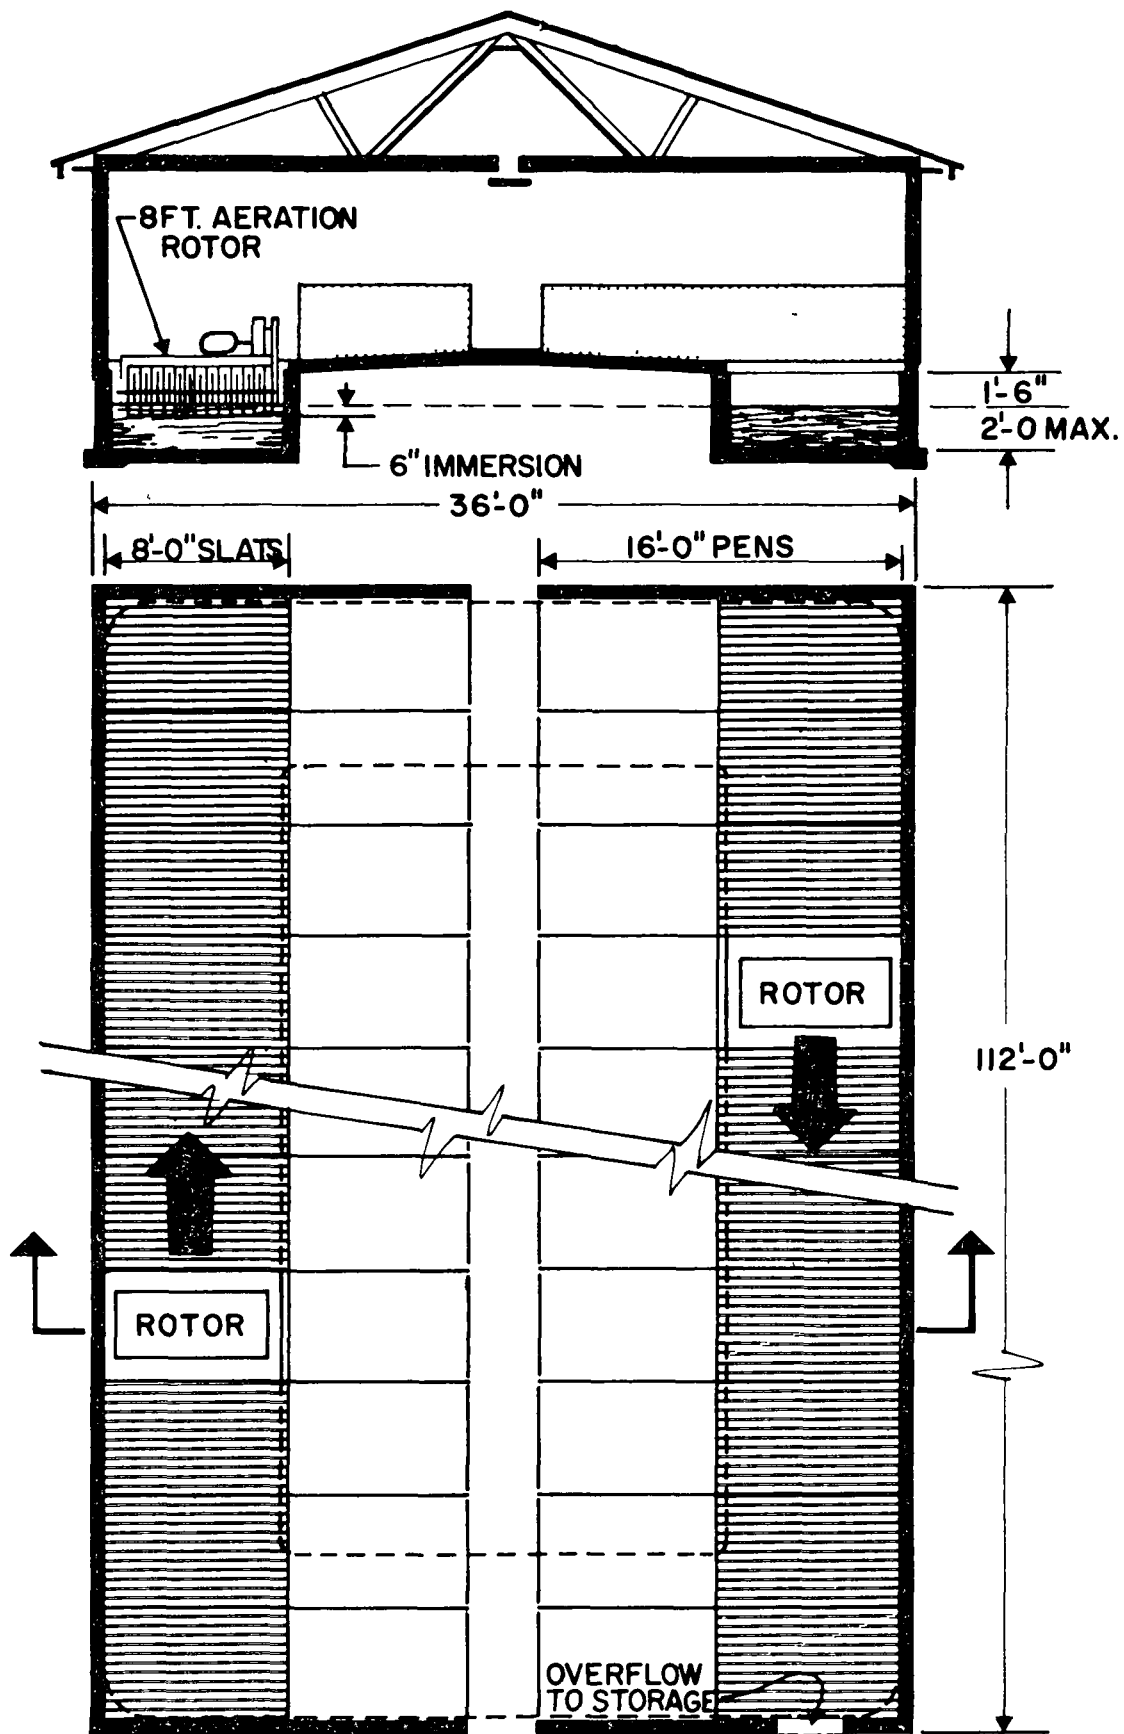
The Indoor Oxidation Ditch Located Beneath the Slotted Floor Sections of a Swine Building
